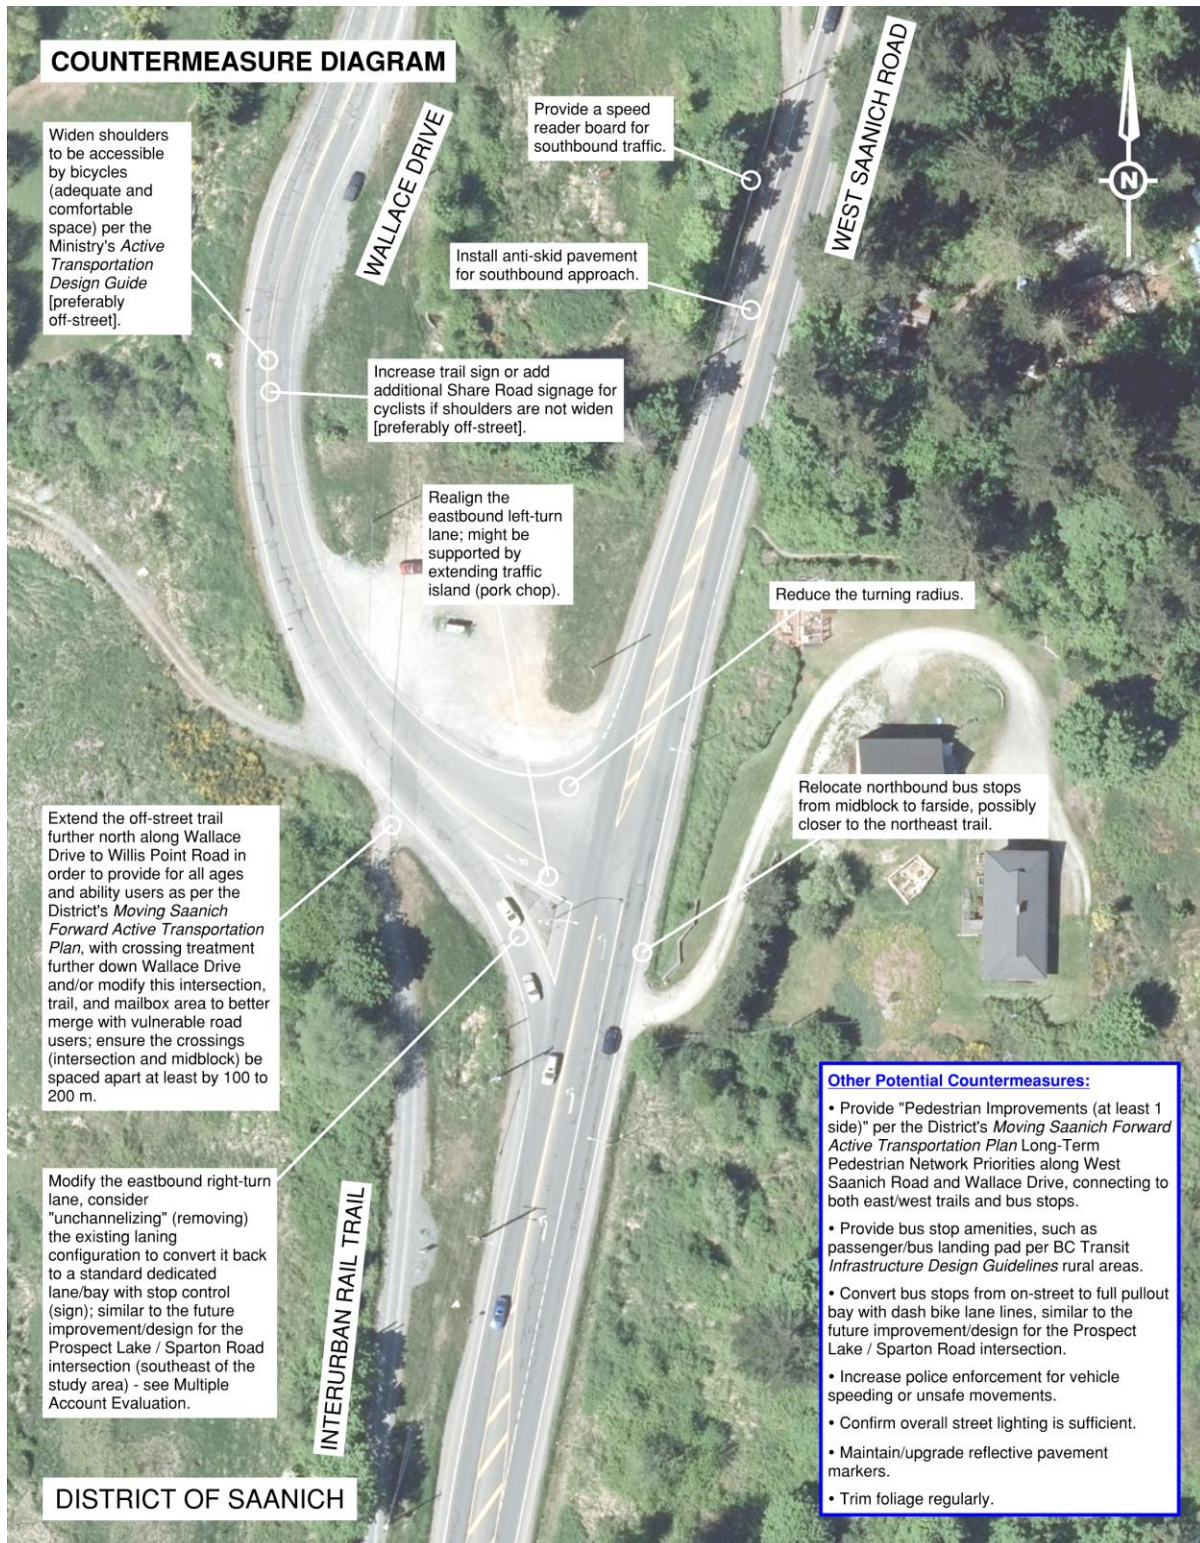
Recommended Countermeasures – Wallace Drive at West Saanich Road & Trail
